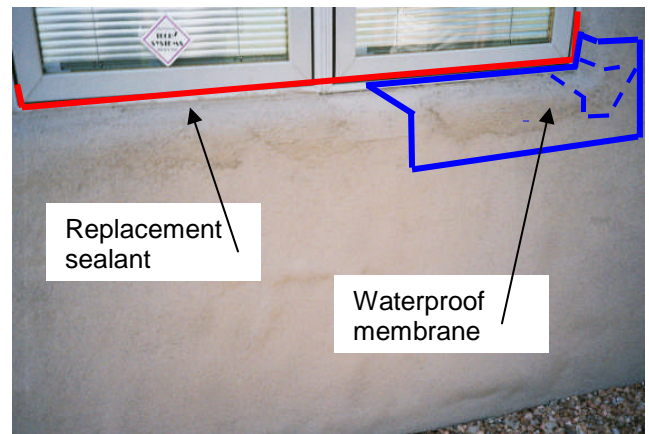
the sill area is the likely source of water intrusion. Waterproofing with glass fiber reinforcing mesh is installed minimum 6" down the sill and 4" up the jambs. Note the extra piece of waterproofing at the corner to ensure complete protection. Perimeter sealant, if missing or deteriorated, should also be replaced.
